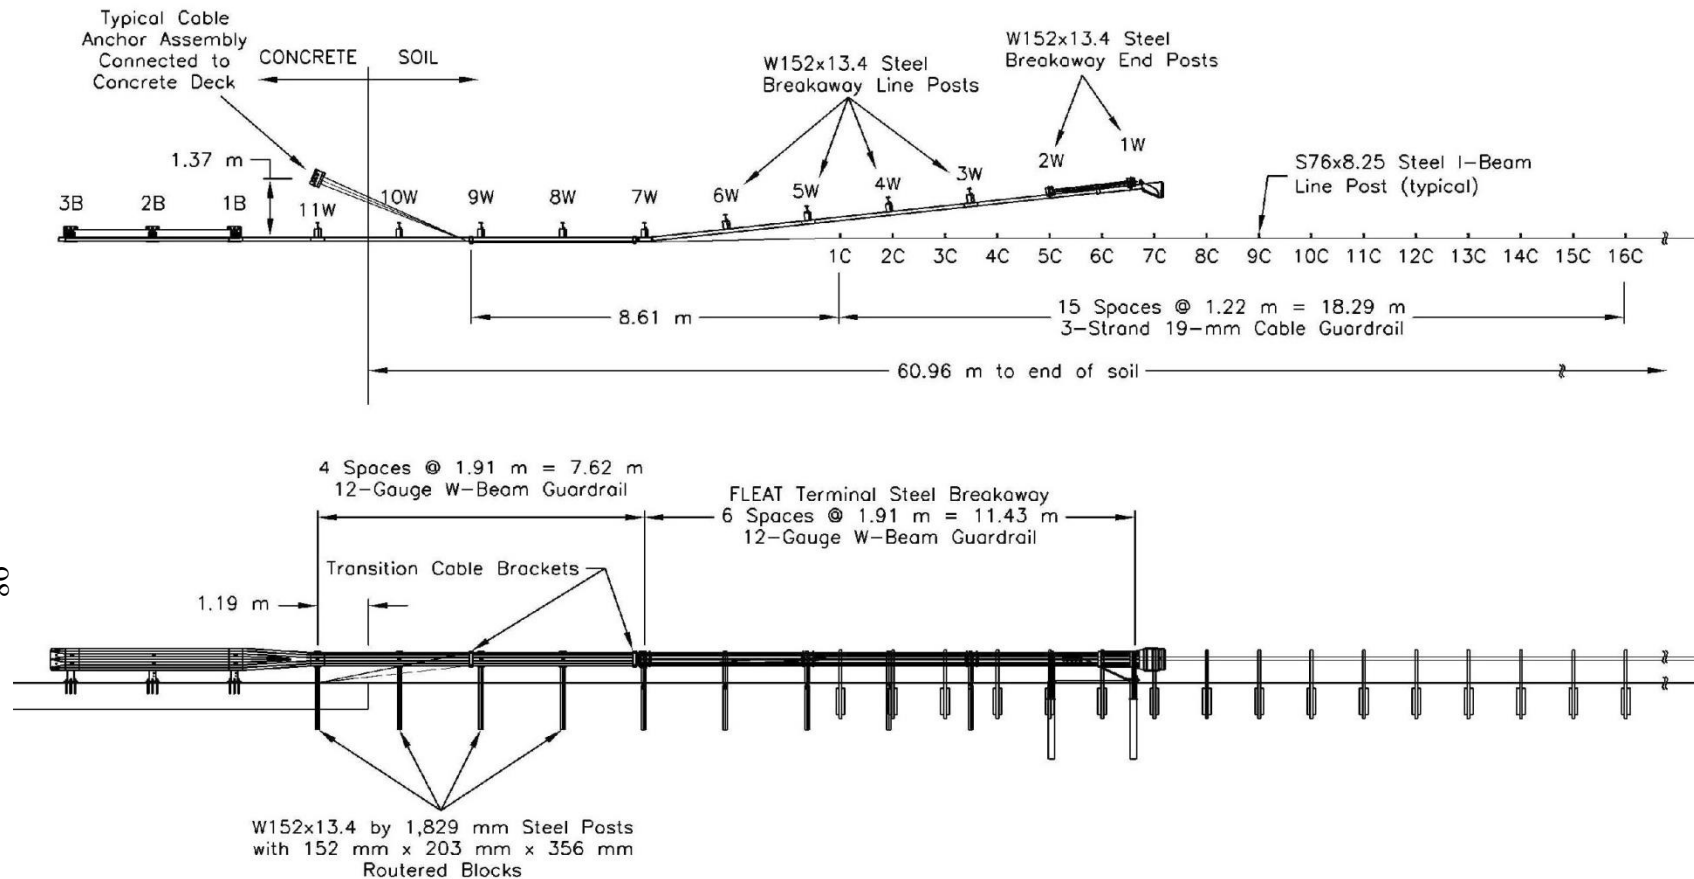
Cable Transition to FLEAT End Terminal Details, Test FCT-1, 2003 [59]
